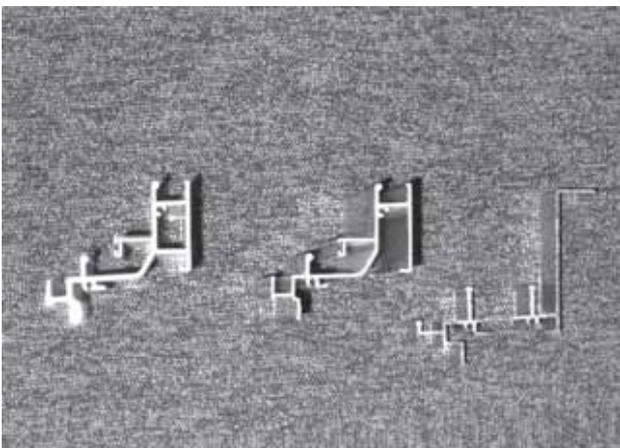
Cross section example of the sash lower frame (The frame on the far left is equipped with reinforced board and flashing.)
